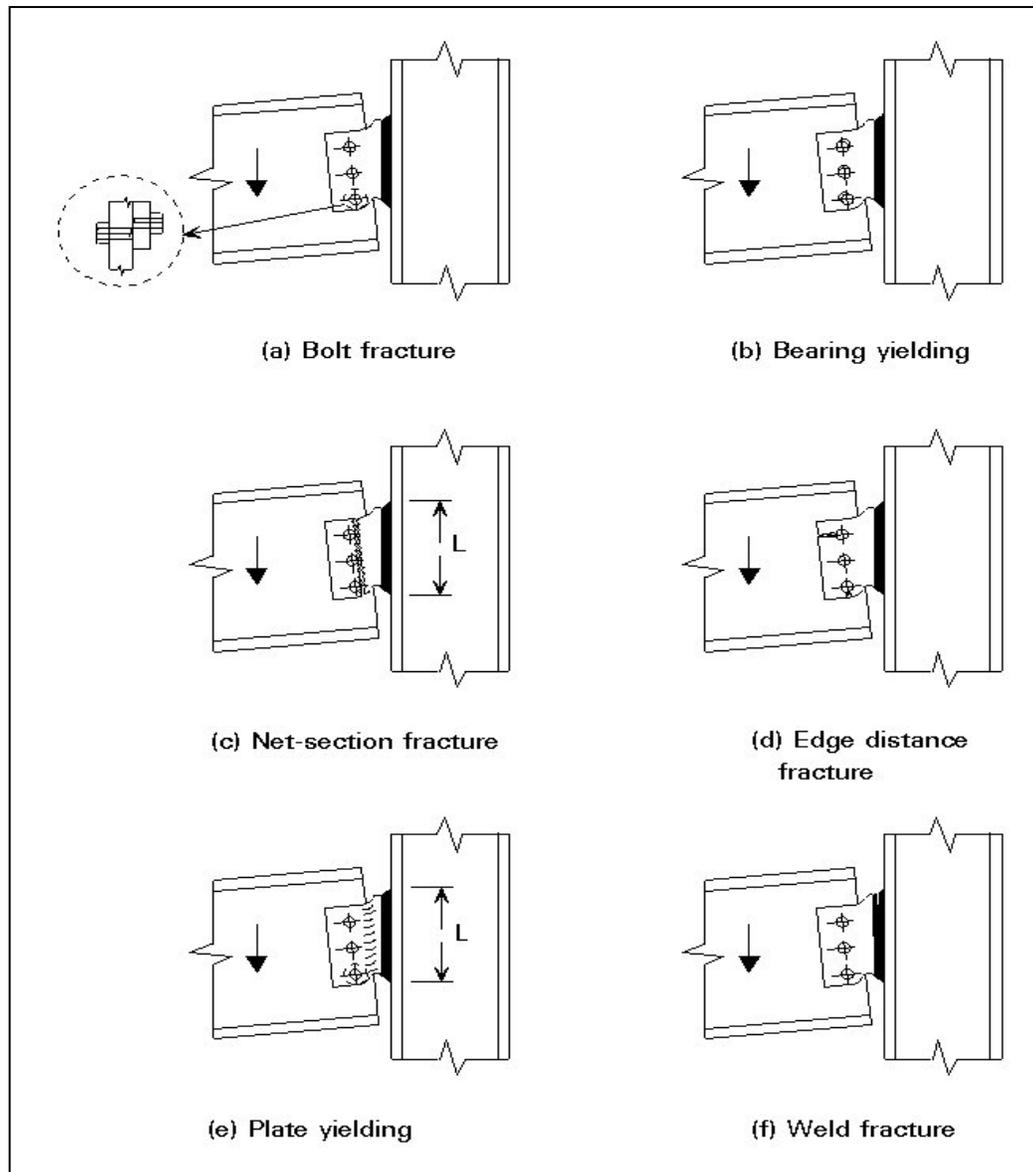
Illustrates the 6 possible failure modes for a fin plate connection
